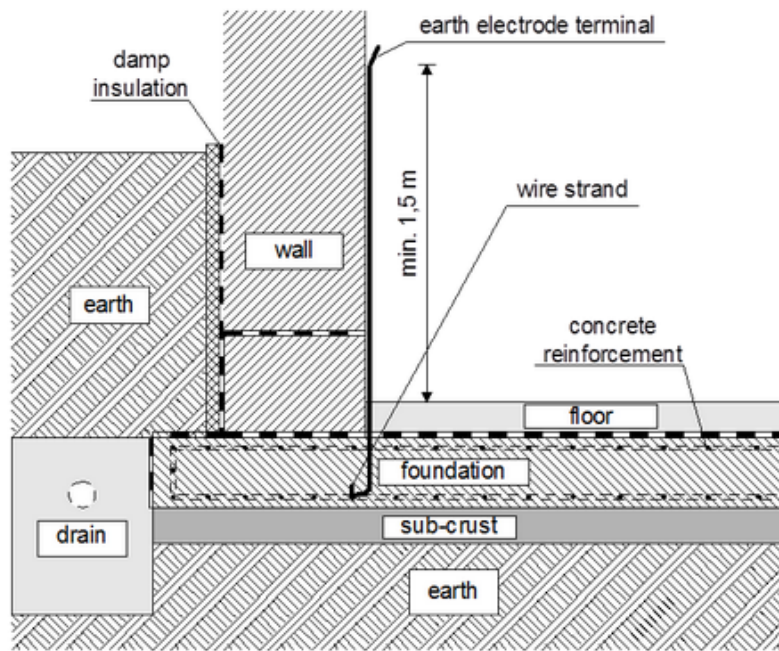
Illustration of the placement of the foundation earth electrode in foundation with concrete reinforcement.
